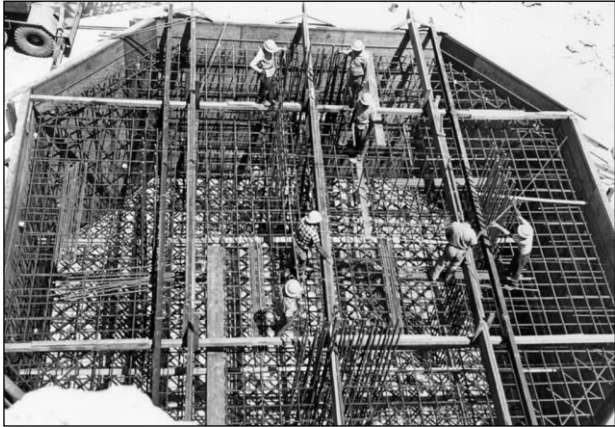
Reinforcement being laid out in the pedestal of Tower 12 in April 1961 (photo: NAIC Arecibo Observatory, a facility of the NSF).
